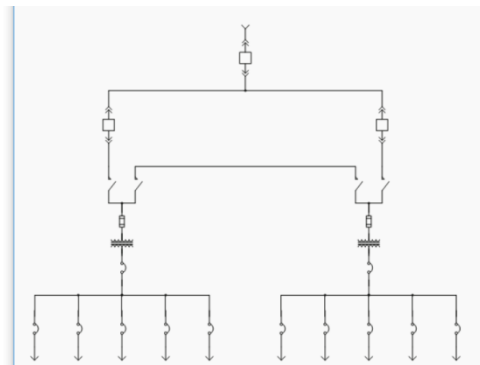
Primary Loop Arrangement. Source: Electrical Engineering Portal
